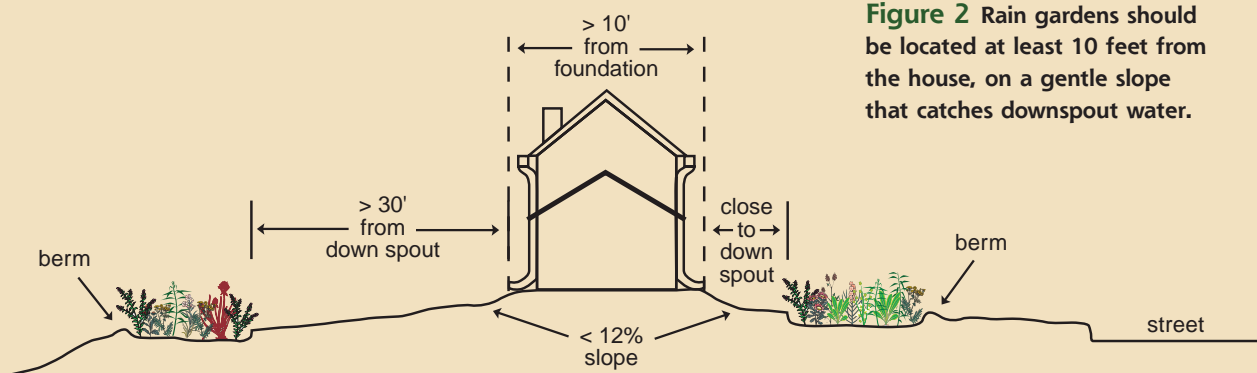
Rain gardens should be located at least 10 feet from the house, on a gentle slope that catches downspout water.
